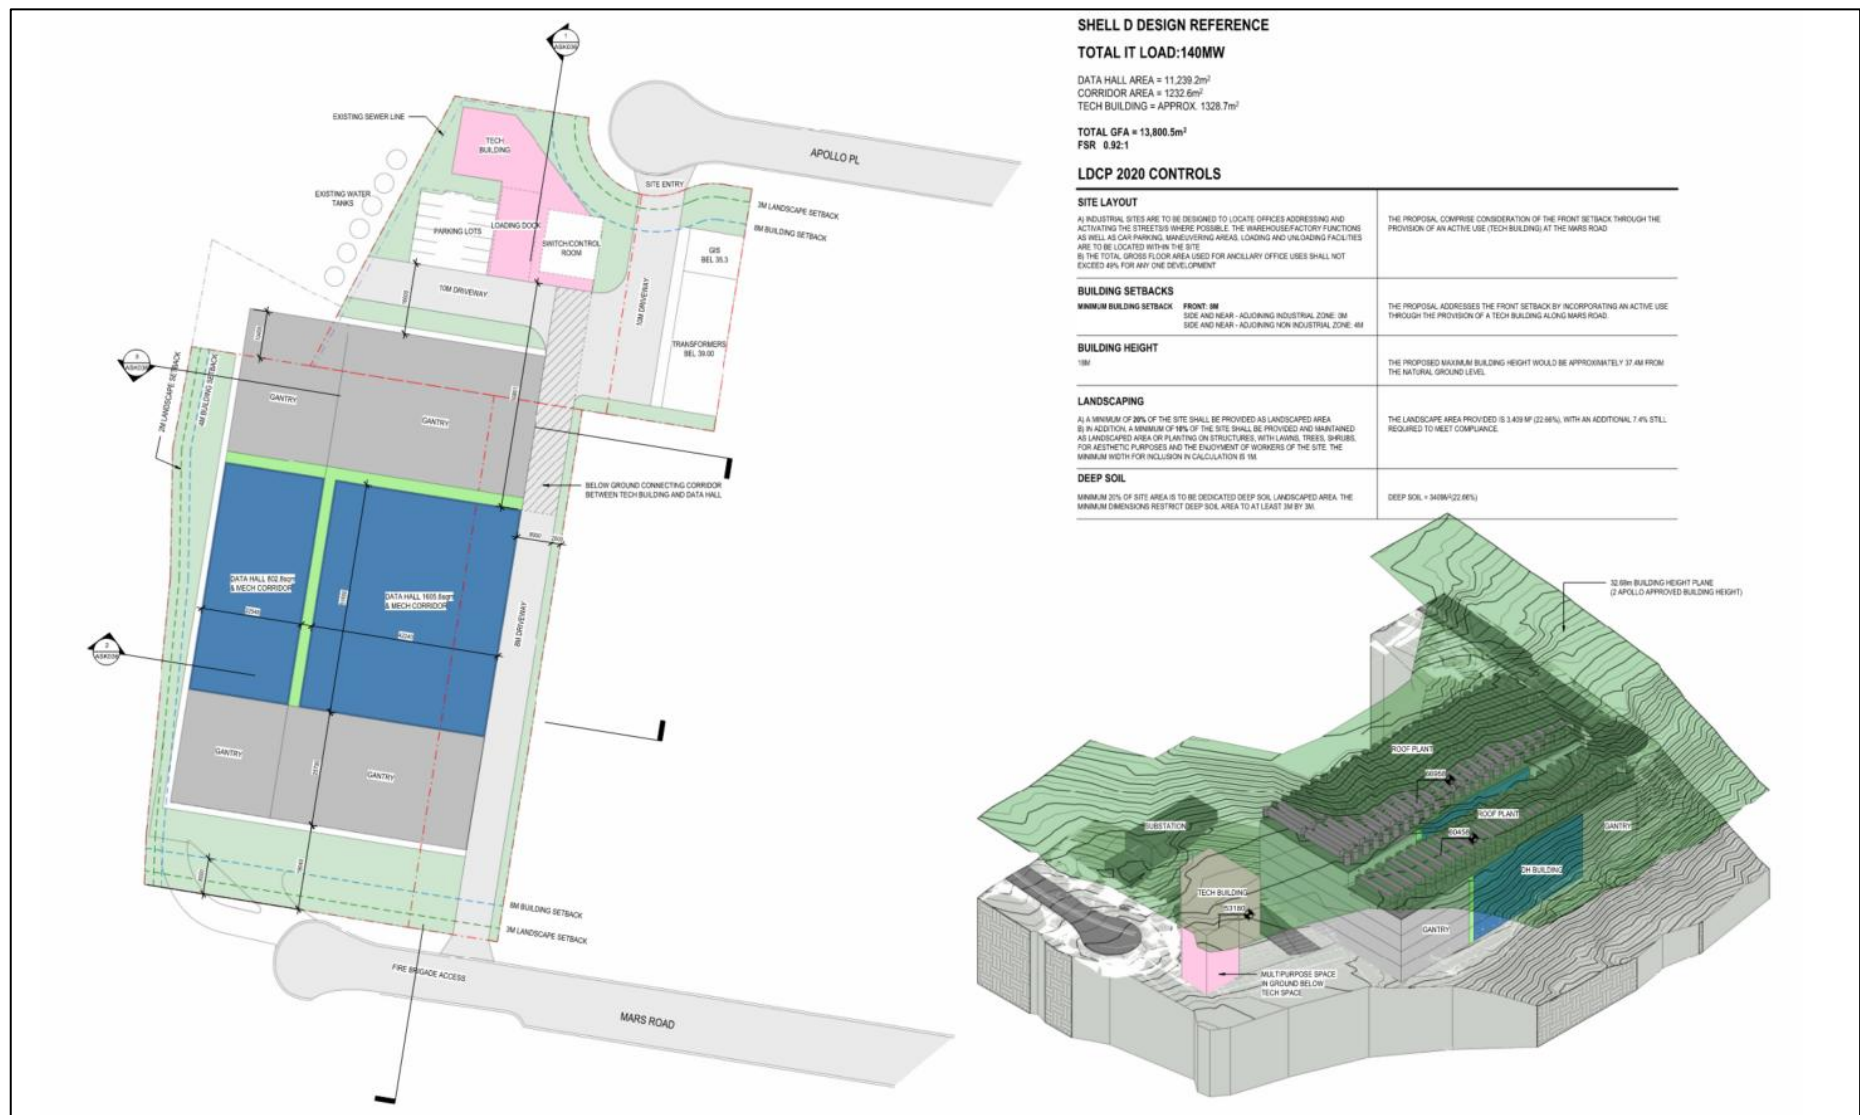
Concept Masterplan (Source: Greenbox Architecture, 2026)
